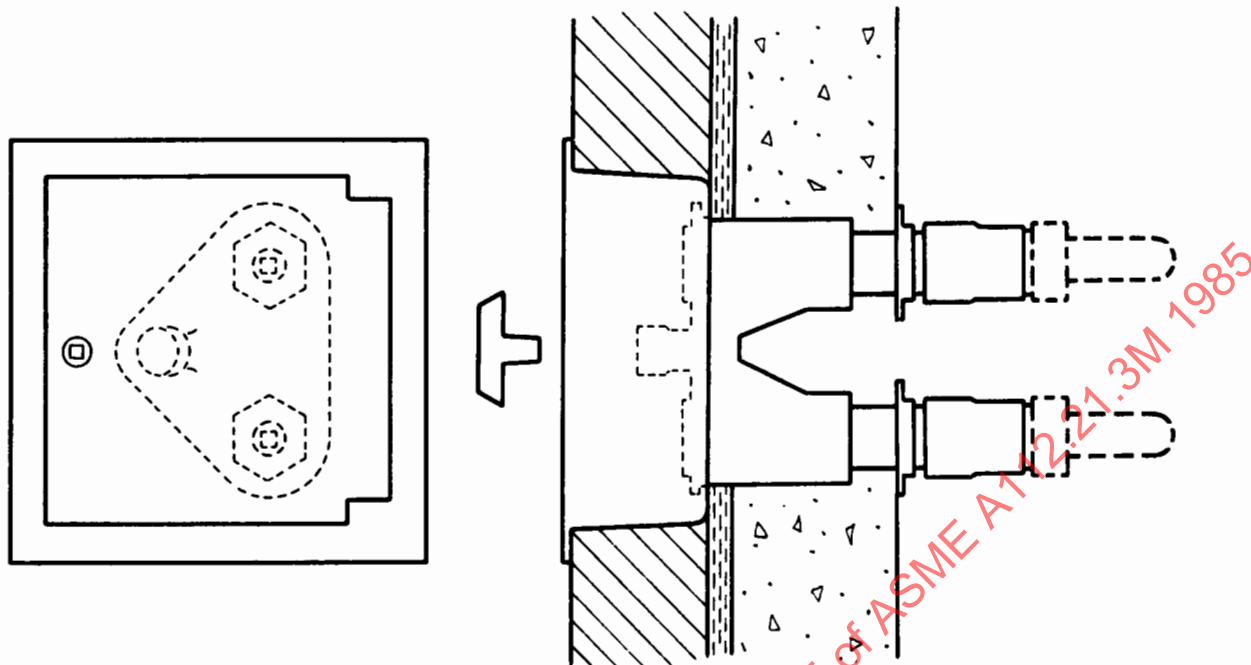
D RECOMMENDED INSTALLATION (PLAN VIEW) WITH VALVE BEHIND BUILDING WALL
